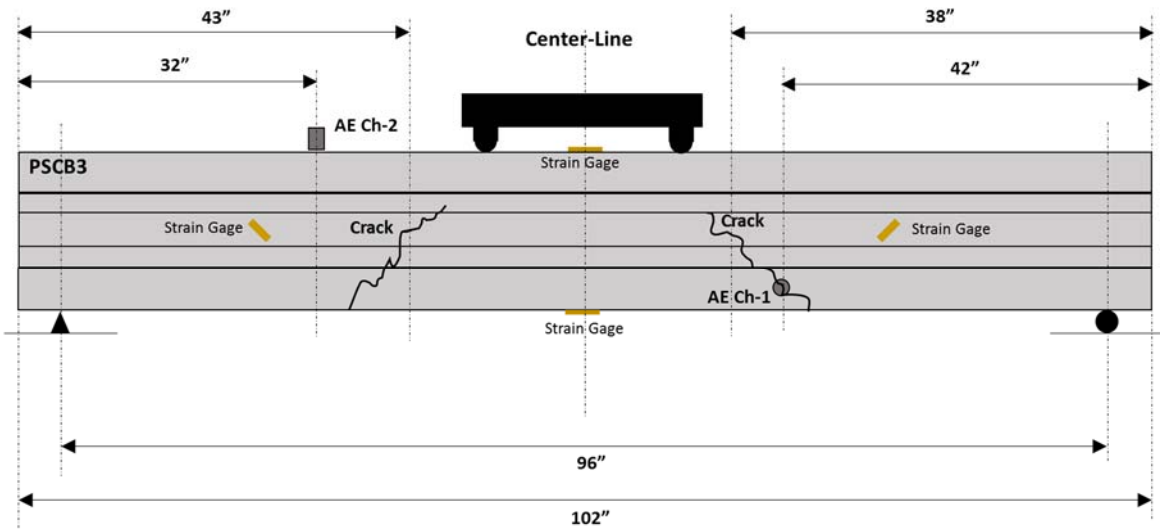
Locations of the gages, transducers and the cracks of the prestressed concrete beam before repair.
